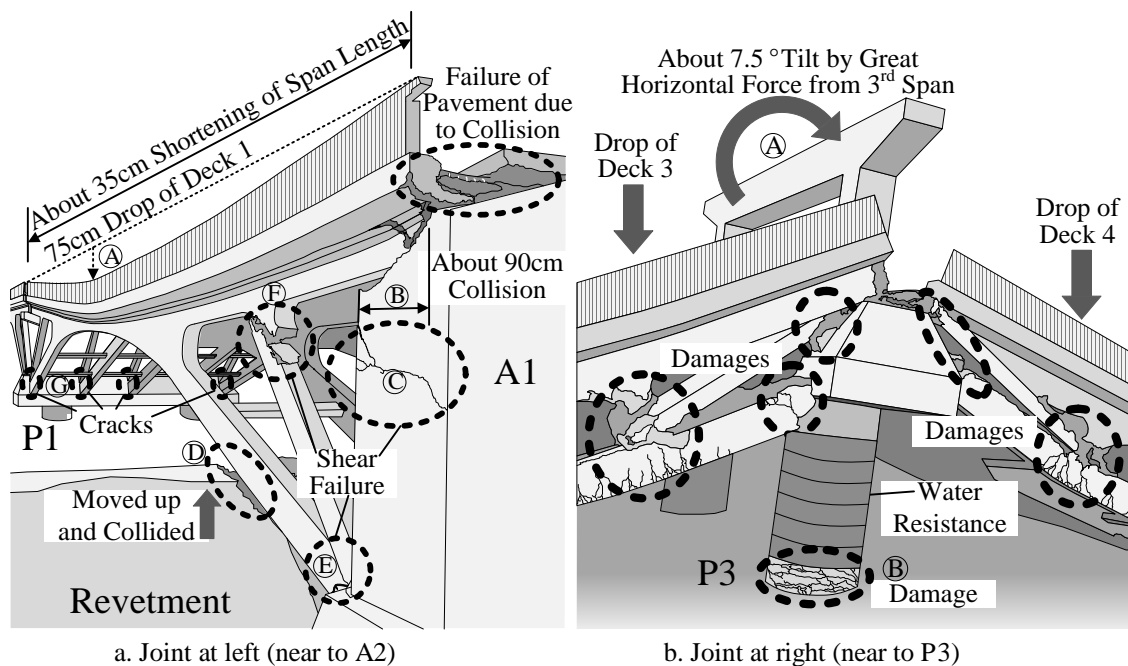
Damage condition of Span 1 and Pier 3
